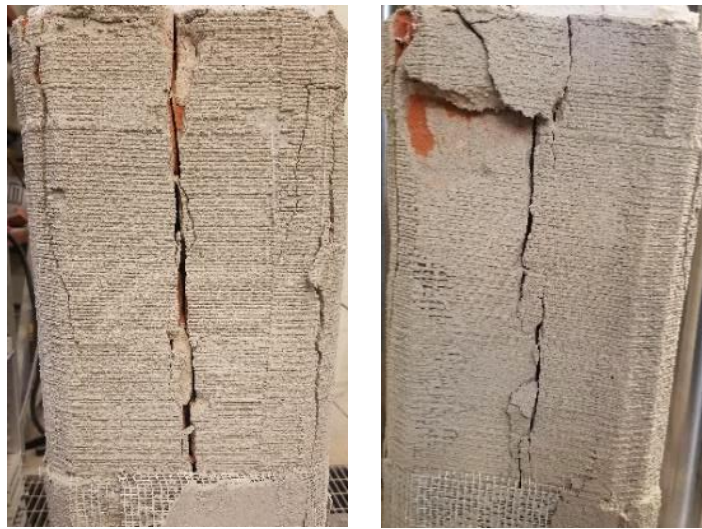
Column C-12-38-1-2 Exposure of Vertical Cracks in Masonry Column
